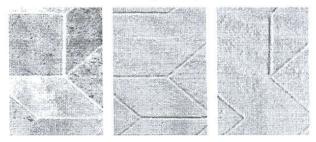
Floor Coating with Imprinted 3D-Pattern: a) Color Image; b) Slope N'S'; c) Slope E'W'
